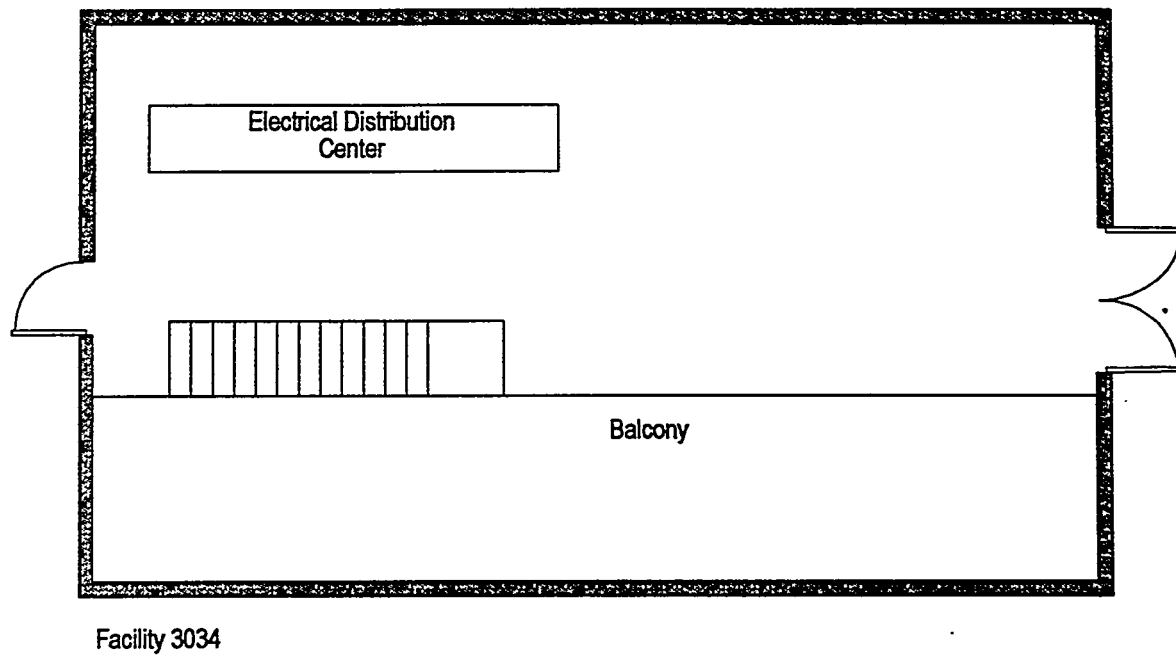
Floor plan of Building 3034—Radioisotope Area Service.
